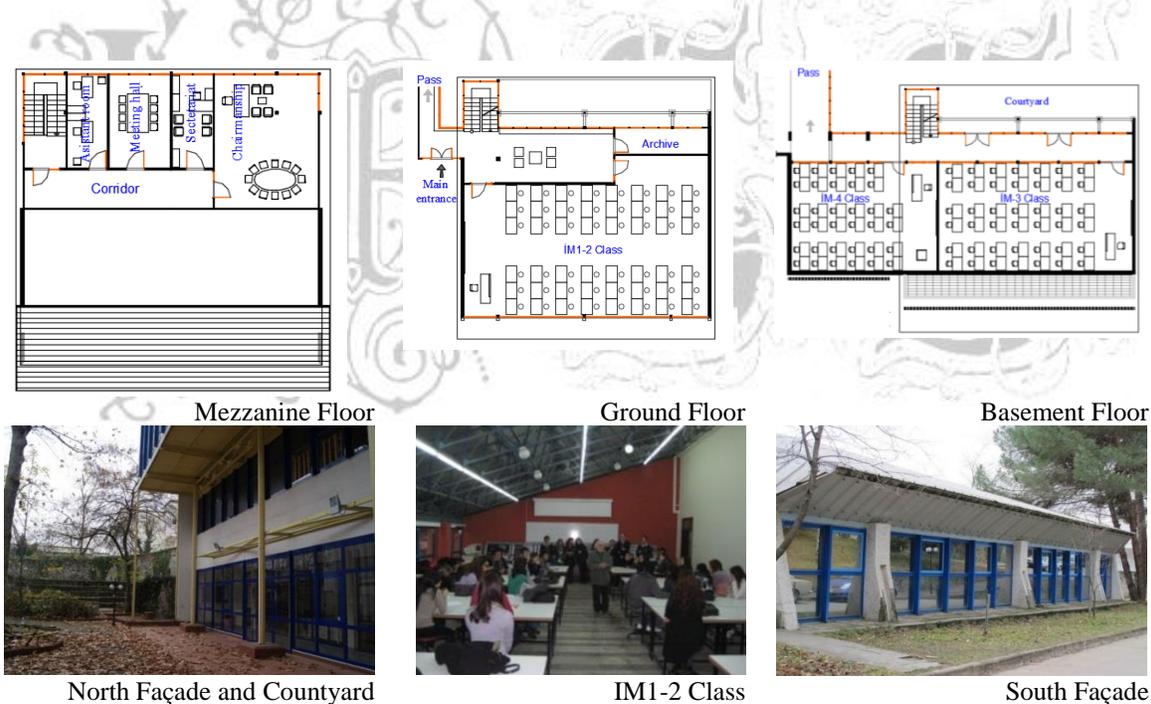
Visual and drawings belonging to the KTU Department of Architecture Building
